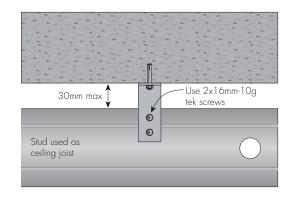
Ceiling Continuous Joist to Angle Bracket
